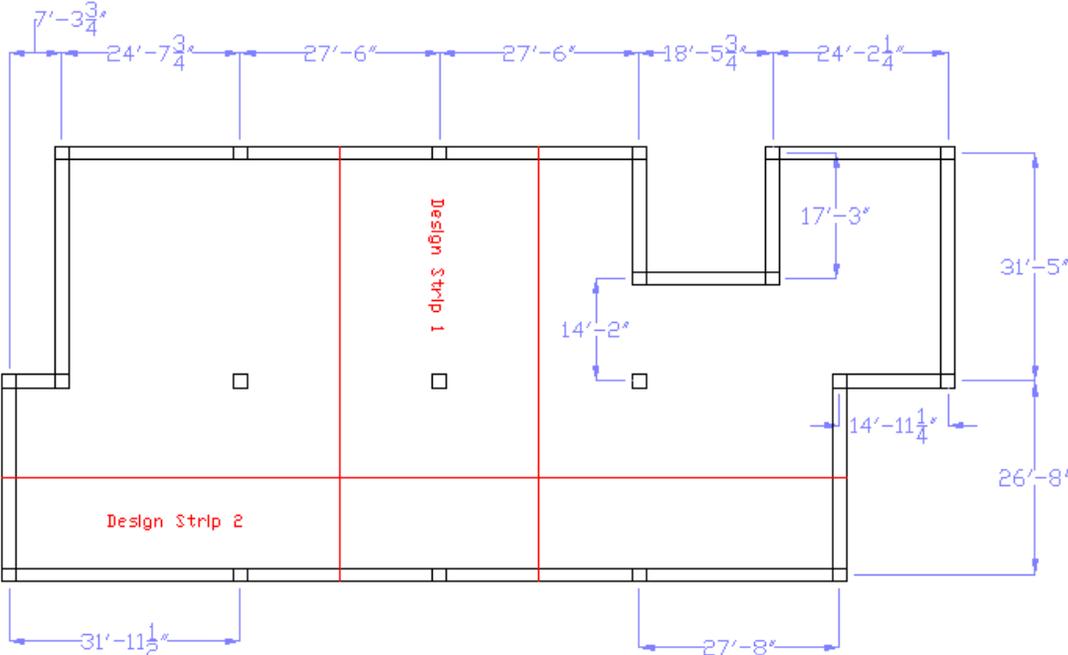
Framing Plan for Two Way Slab with Edge Beams
